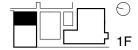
Plan of proposed change of use for bakery, ground floor, 1991 © Building Authority of Prague 8 - Archives, 399 - 3/5 objekt A
